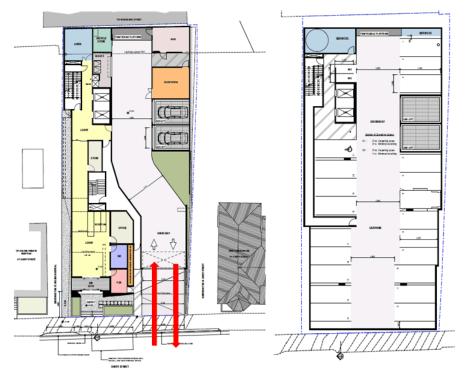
Ground level plan (left) illustrating two-way access and exit to the development from Davey Street. This vehicular access provides routes to an internal car lift, with two levels of basement parking as illustrated in basement plan (right). Source: JAWS Architects.
